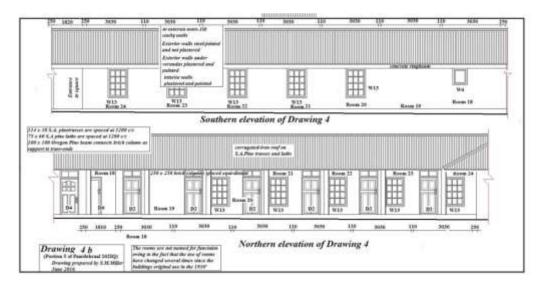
Above. Northern and Southern elevations of the building captured in Drawing 4. (Drawing S.M. Miller 2016.)
